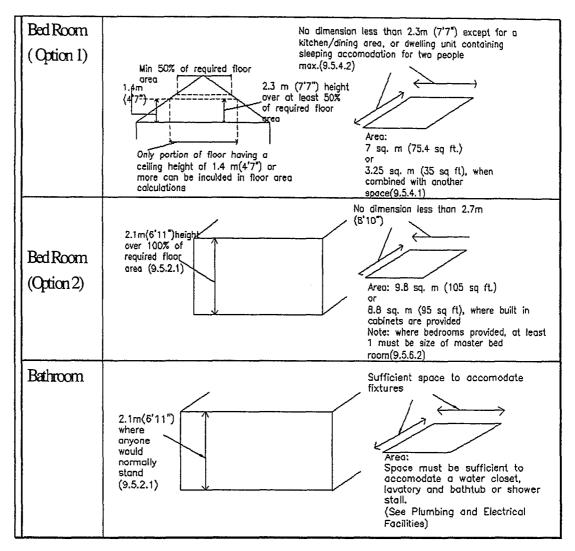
Room Minimum Requirements: Height, Space and Dimensions (2/3)
